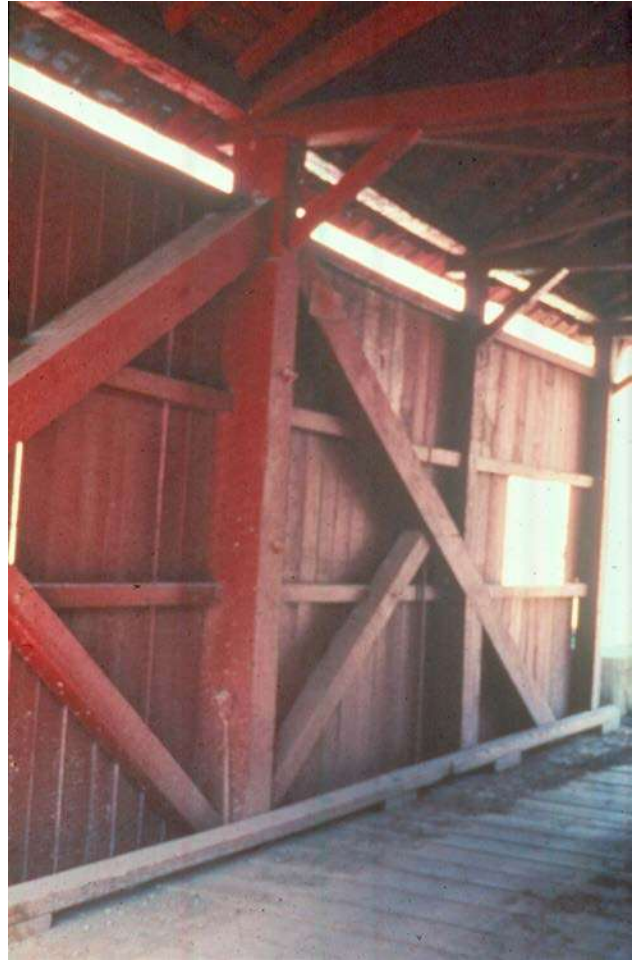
Inside View of Covered Bridge Showing King Post Truss Design
